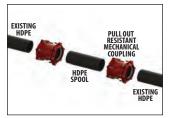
HDPE Pipe Spool Replacement w Mechanical Couplings
